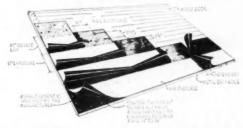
19-inch selvage, double coverage asphalt roll rooting, parallel to eaves
